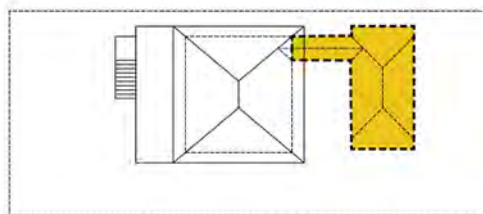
Addition to the rear of a building linked as a new pavilion lower than the established ridge height
